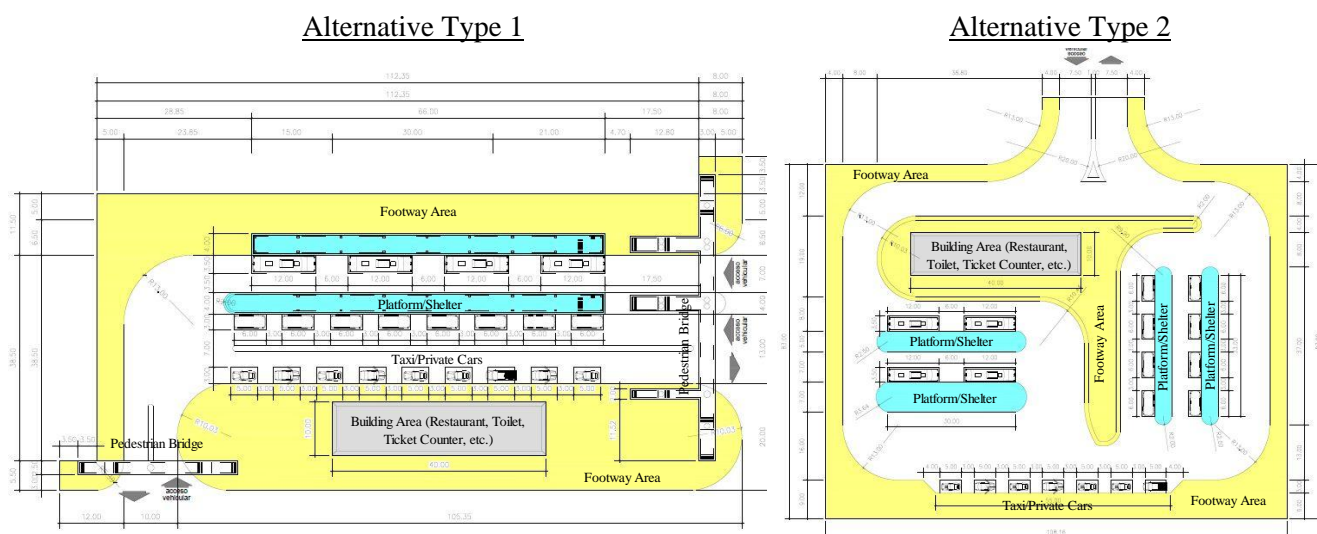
Layout of Typical Bus Terminal by Type
